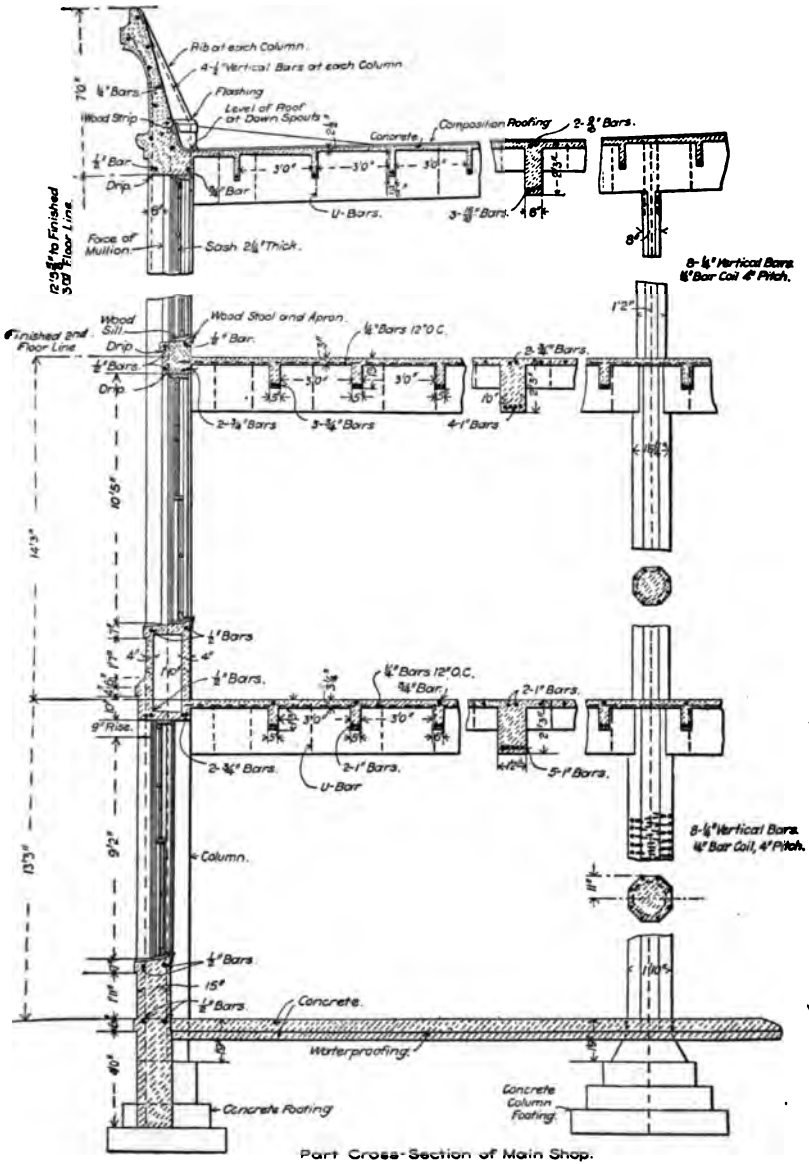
Part Cross-Section of Main Building, United Shoe Machinery Co.'s Works.
